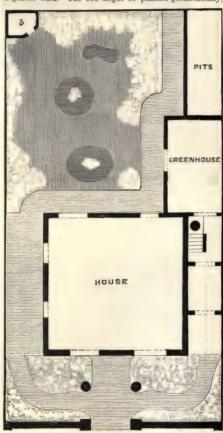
PLAN OF DETACHED VILLA AND GARDEN.
